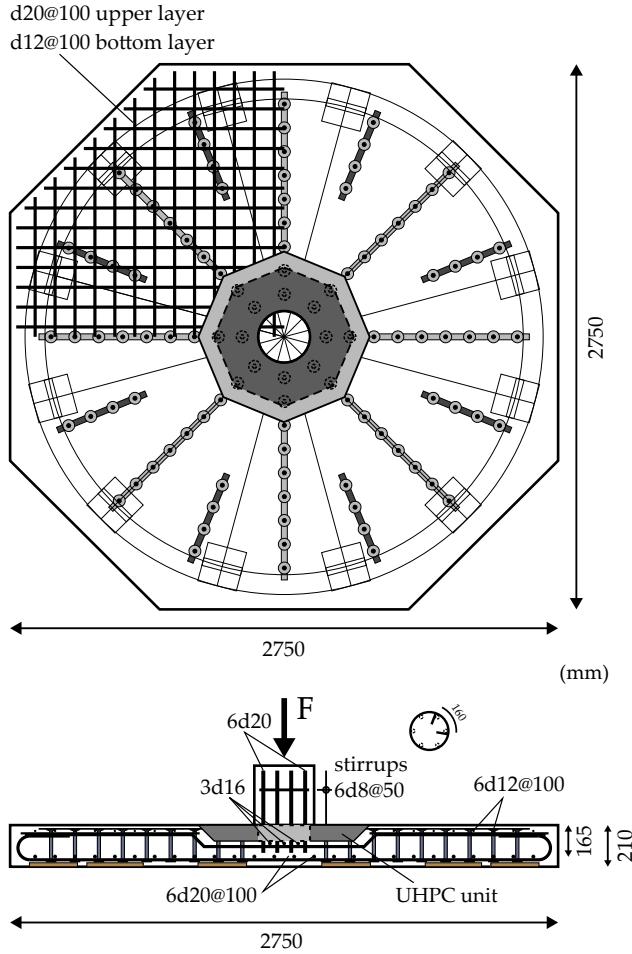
Layout of flexural reinforcement and double-headed studs for test specimen DUHPC2(Ricker et al., 2017).
